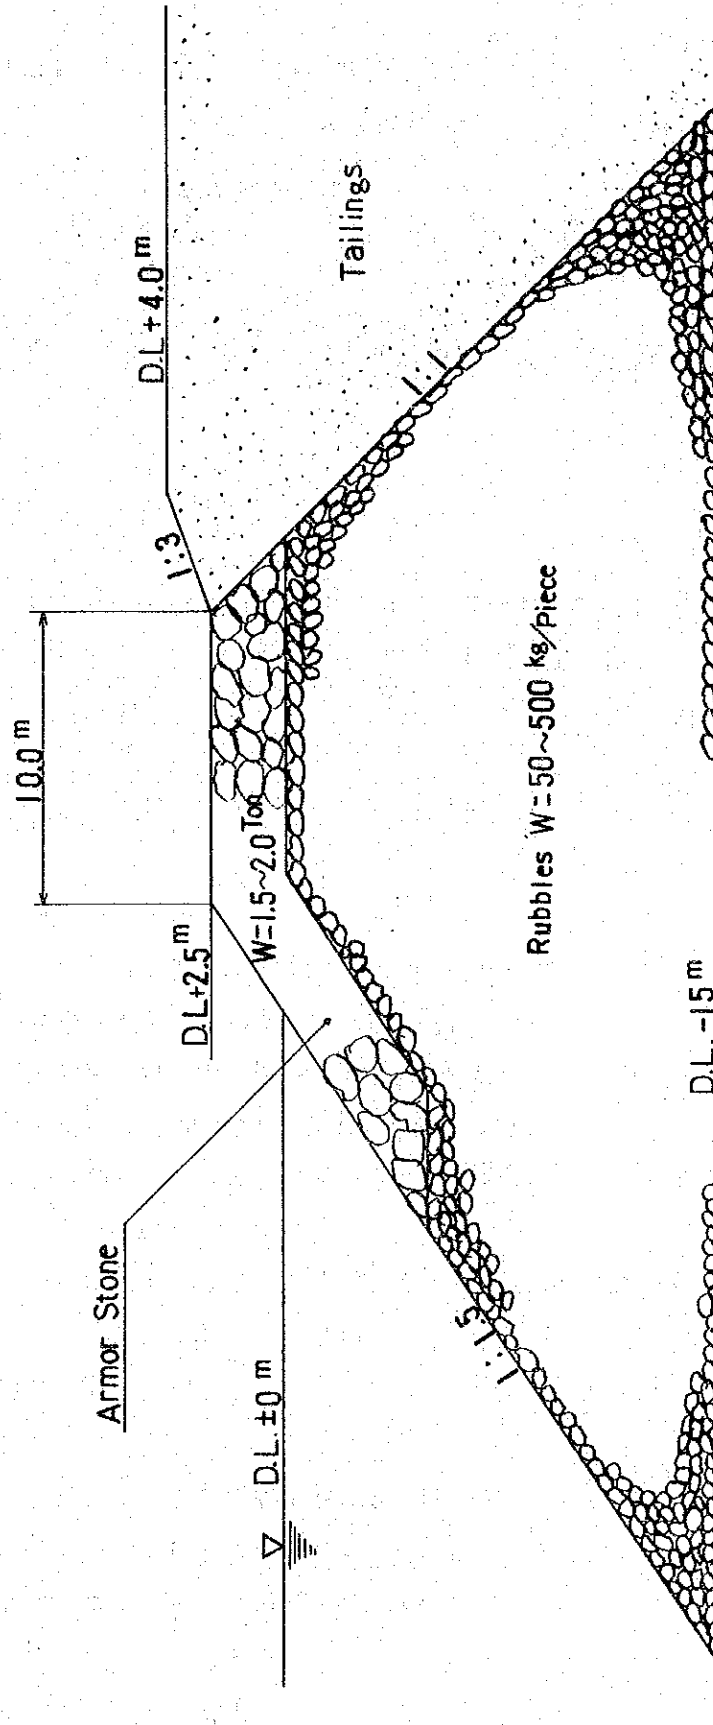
Cross Section of Bulkhead (Rubble Type)
